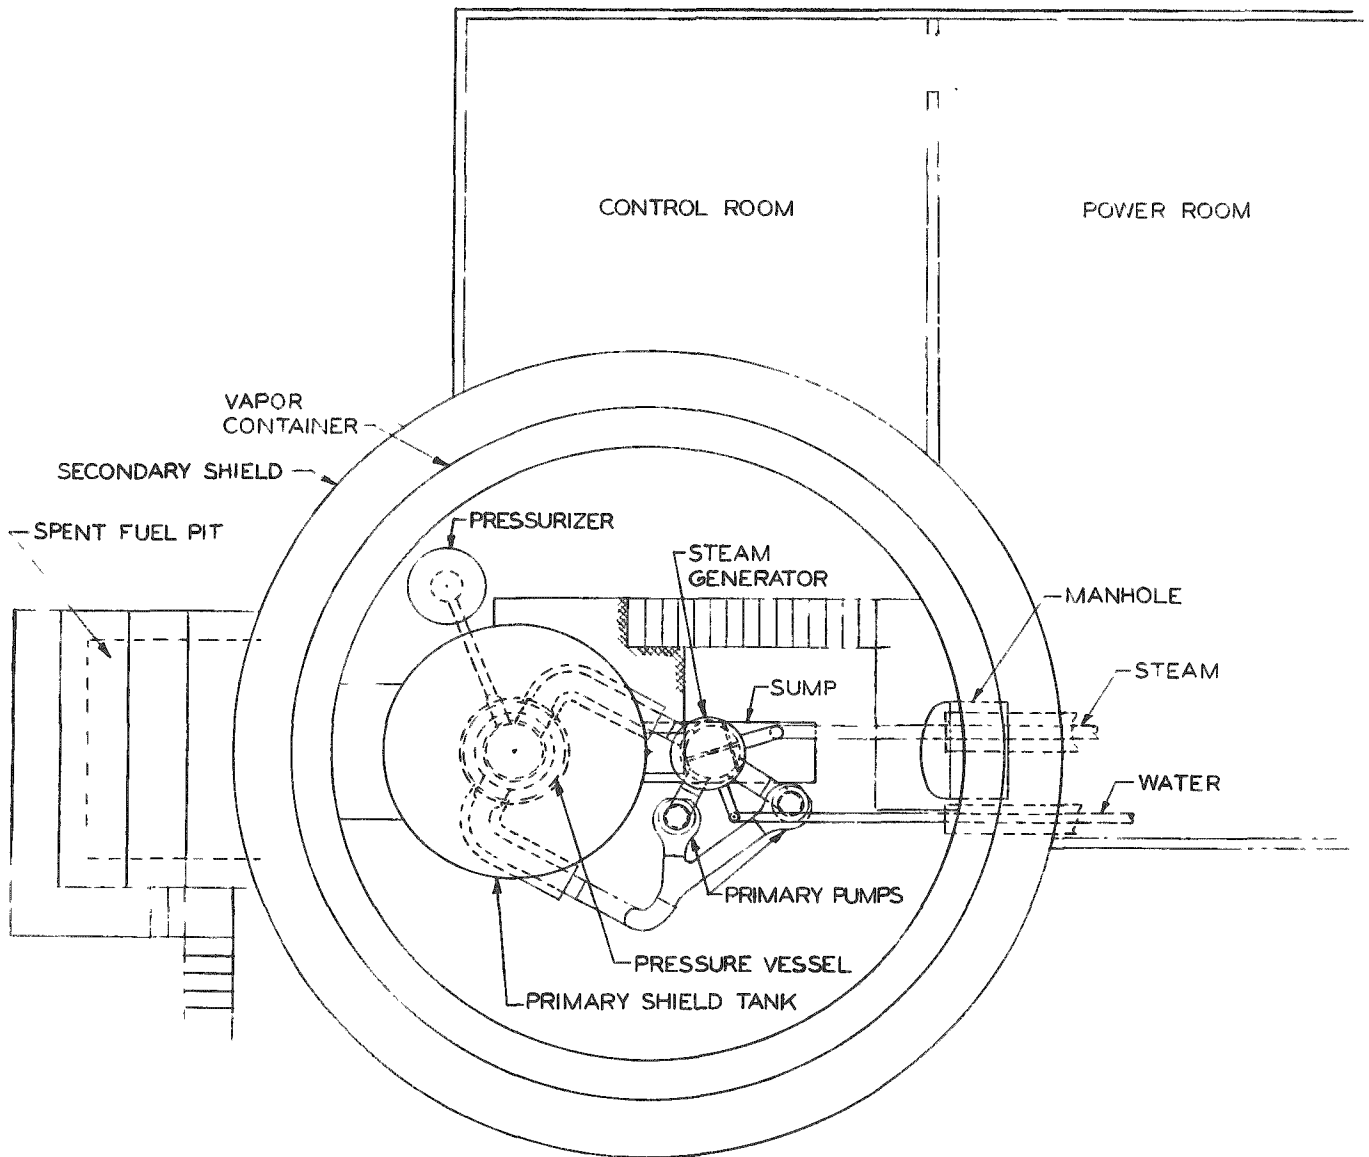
EQUIPMENT ARRANGEMENT IN VAPOR CONTAINER - PLAN
